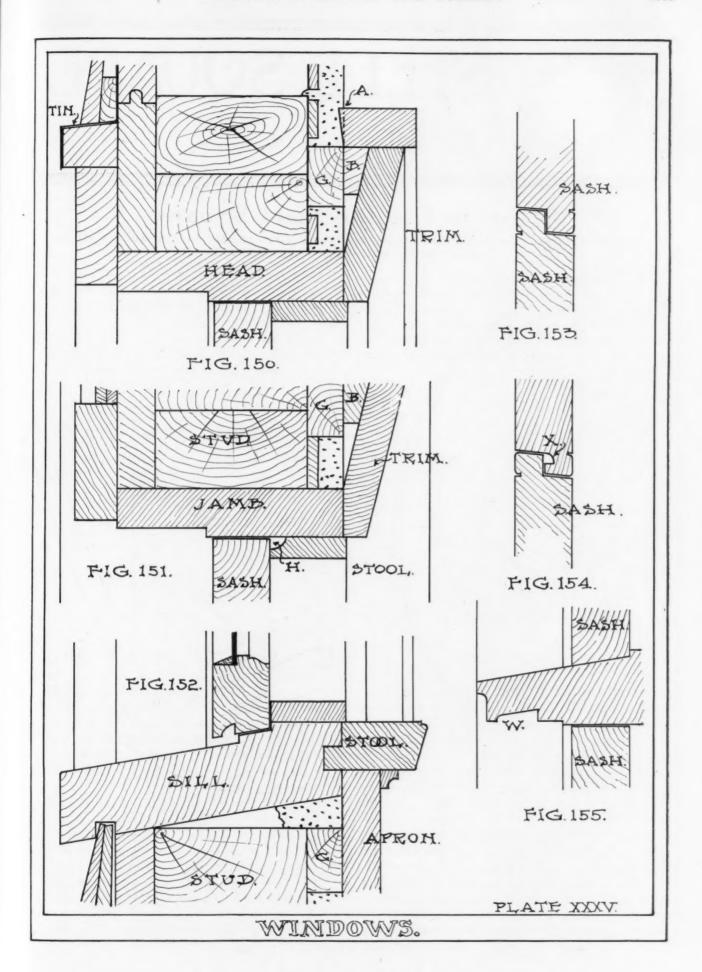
is a vertical section taken through the sill of the window and shows it rebated for sash and ploughed for stool. Stool is molded and should have returned ends. Bed mold and apron should also have returned ends. Sash is grooved on the underside for a drip. Glass should be bedded in putty, sprigged and back puttied. Where plate glass is used wood beads should be used to hold the glass in position and putty should be used as a bed for the glass.
